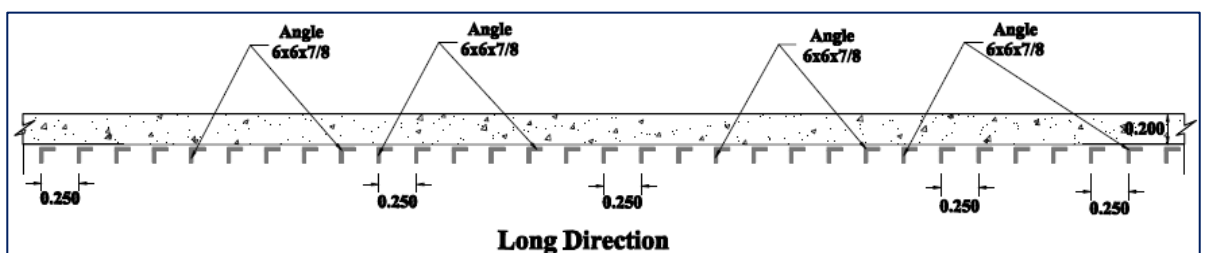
Reinforced Concrete Tile to Fill the Hole in Slab
